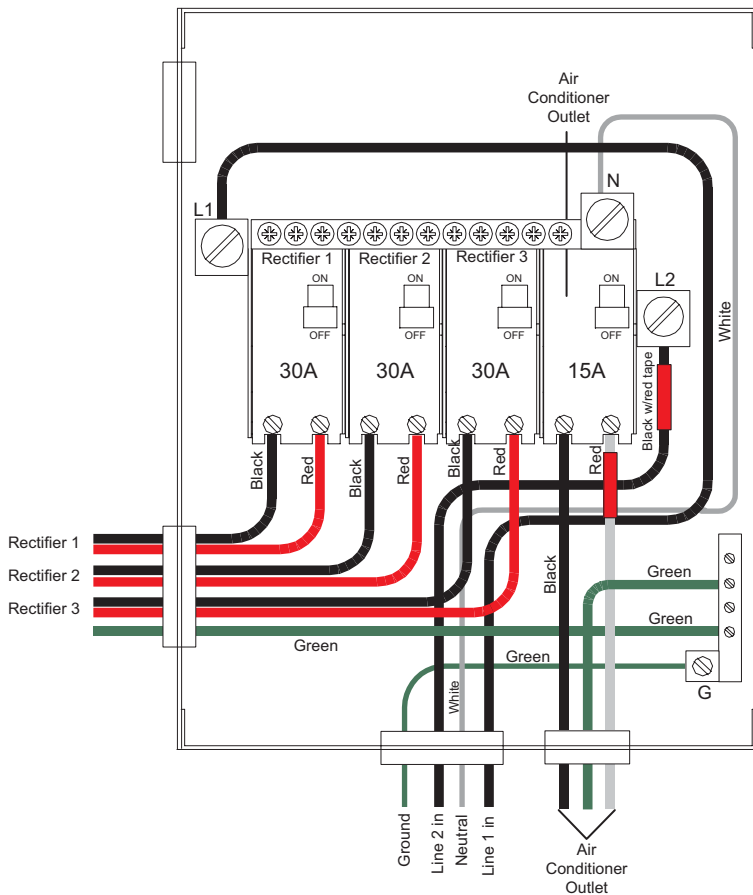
, Enclosure Breaker Box Wiring Schematic
